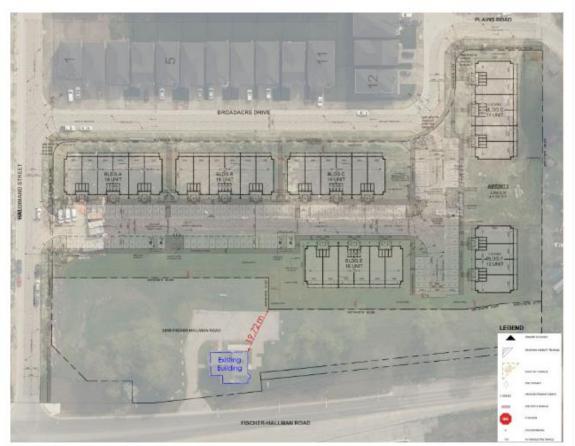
Proposed site plan for the subject property. Source: Draft HIA
